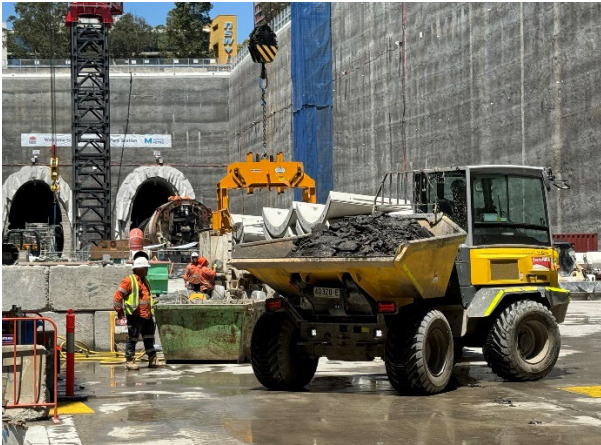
SOP Site: Cross passage excavations ongoing. Spoil brought to station box for stockpiling 24/7; load-out to surface in daytime.
